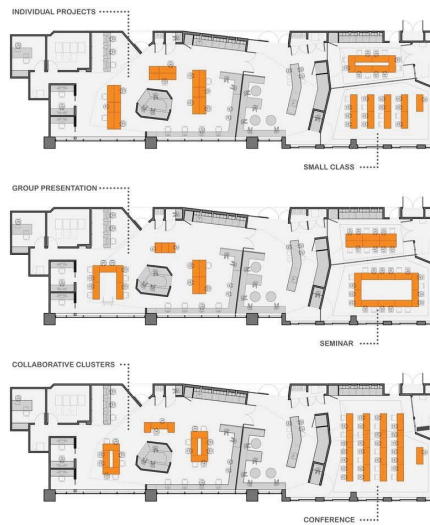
Beaver Works Classroom Configurations (source: Archdaily)
